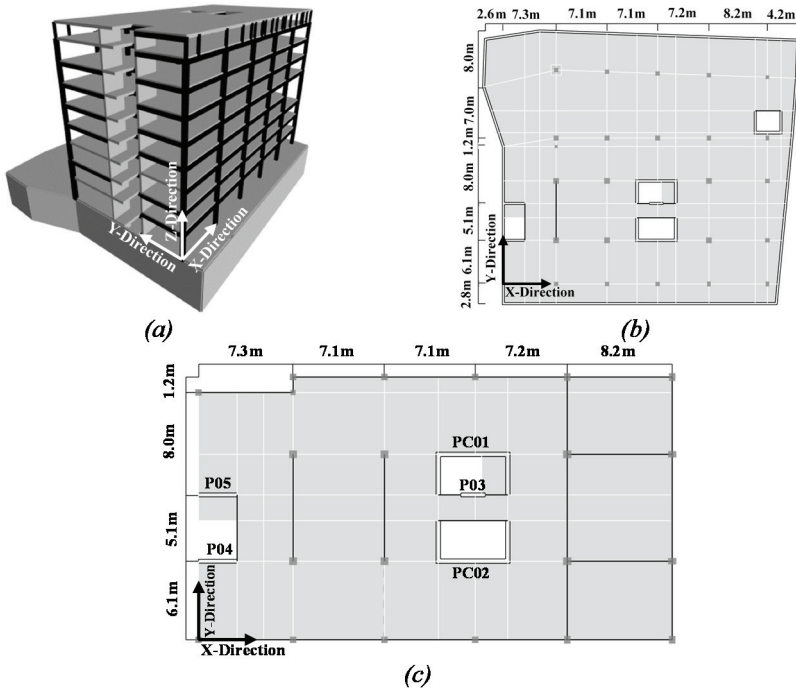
The archetypal RC building: (a) 3D view (b) typical plan view of the basement floors (c) typical plan view of the superstructure floors.
